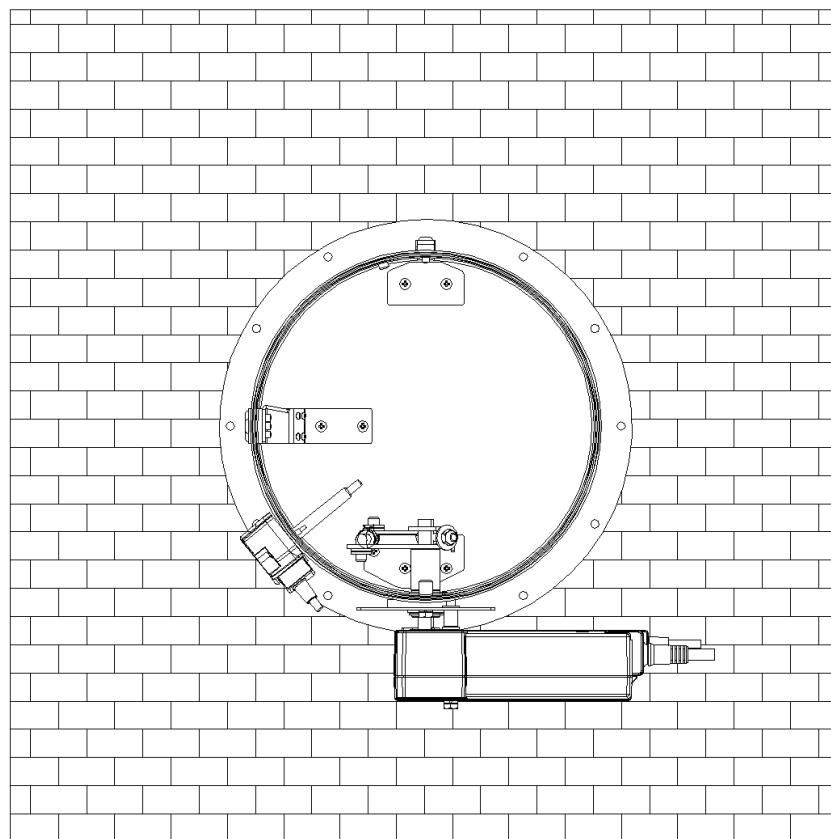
Installation of KTS-O in rigid wall construction with vertical axis of rotation of the damper.
